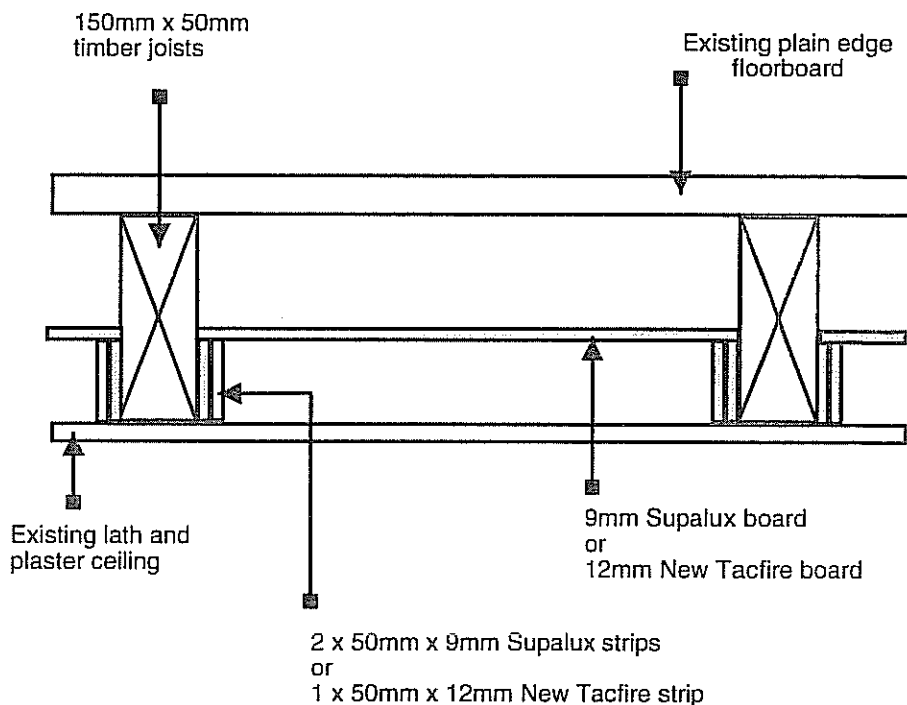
Use of Supalux or New Tacfire above an existing ceiling to provide 30 minutes fire resistance
